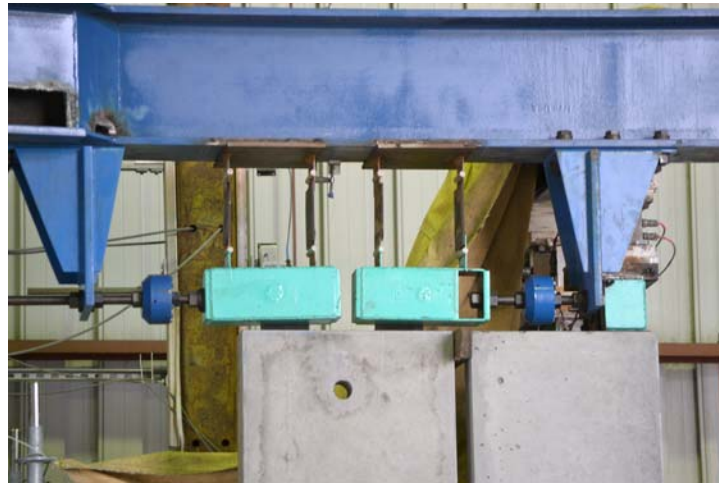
Exterior Elevation of Ground Level Test Specimen installed in Reaction Frame
